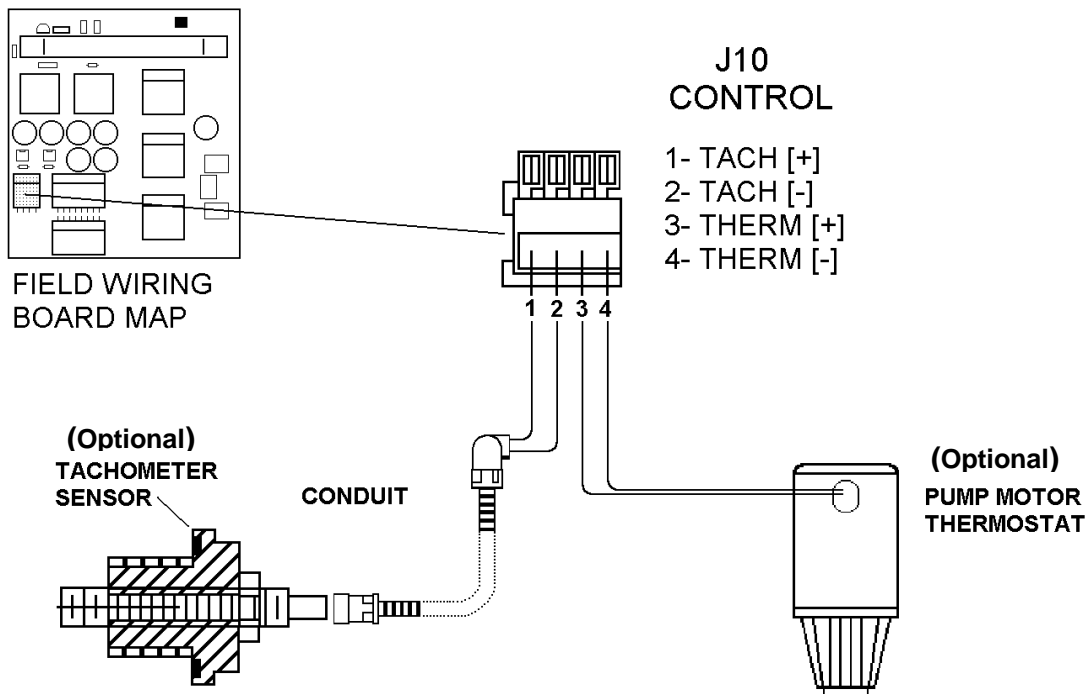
Tachometer and Pump Motor Thermostat Connections
